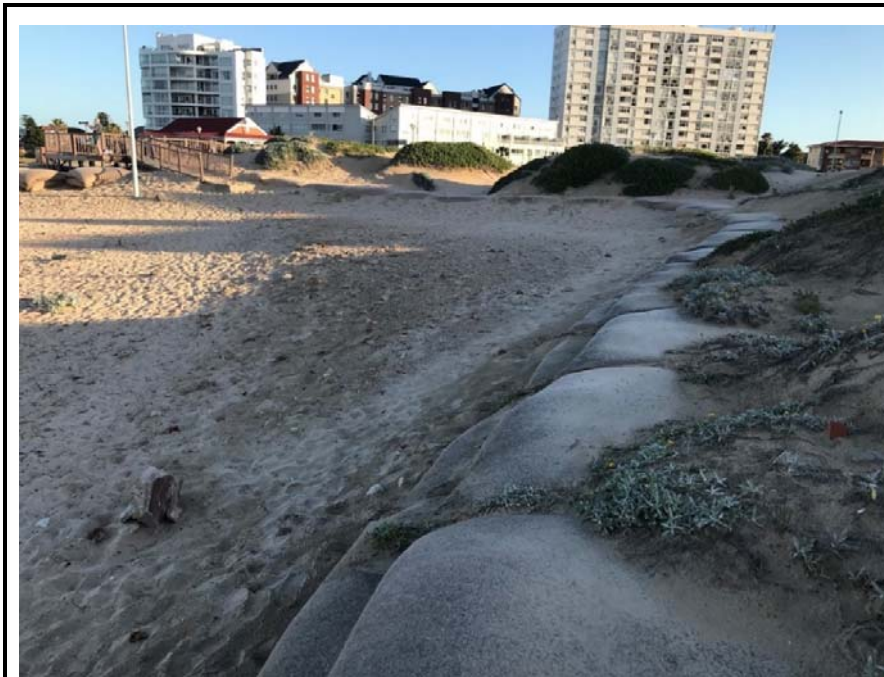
Beach and coastal dunes at Pollock beach, Summerstrand, in the vicinity of the cable landing site (geofabric bags are being used for stabilisation)
